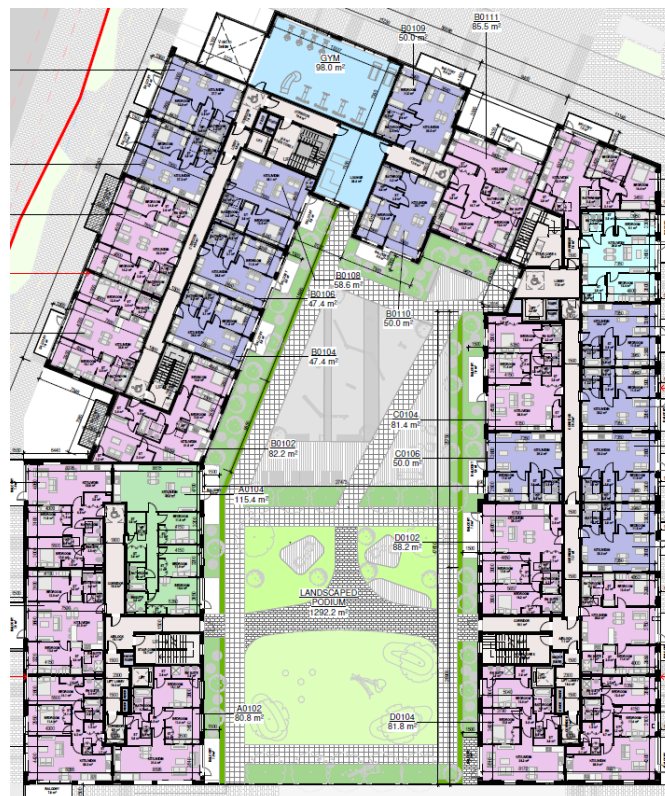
First floor plan. We note provision of 28 no. residential apartments (12 no. one-bedroom apartments, 15 no. two-bedroom apartments and 1 no. three-bedroom apartments), a resident’s lounge, gym and external amenity space at this level.
